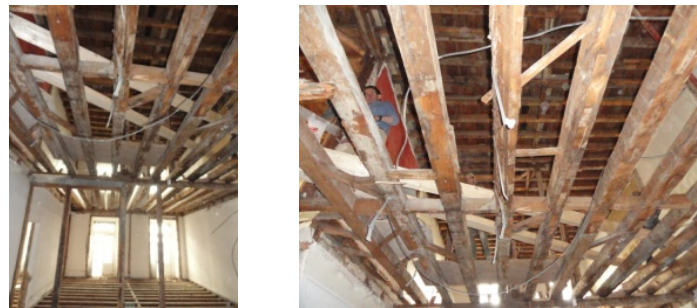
Floor beams placed on both directions on corner building of a 'pombalino' quarter.
